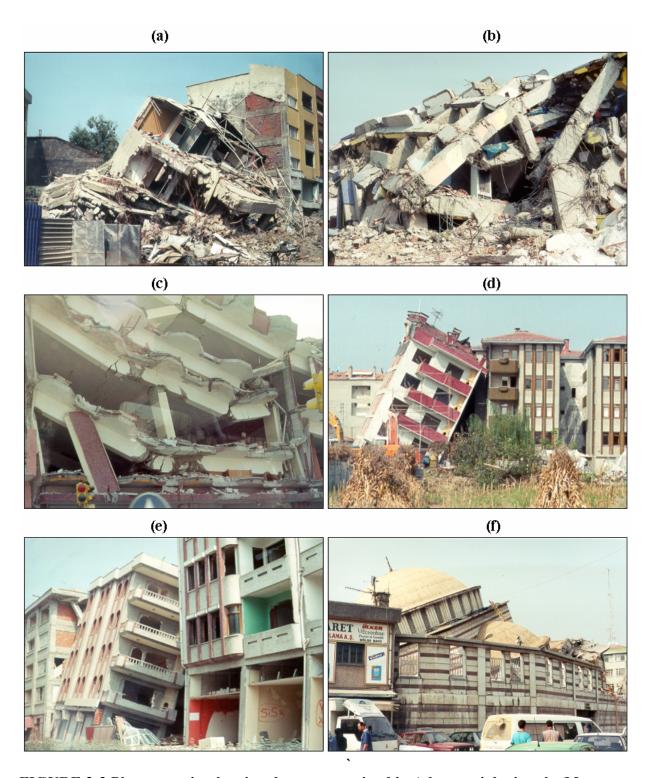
Photo mosaic, showing damage sustained in Adapazari during the Marmara earthquake: (a-b) extensive building collapse; (c) building collapse through pancaking of the floors; (d-e) severe tilting caused by collapse of the first floor; (f) building damage extends beyond residential structures to include religious centers. Building damage such as this is recorded as changes in optical and SAR remote sensing imagery, acquired before and after the earthquake.
